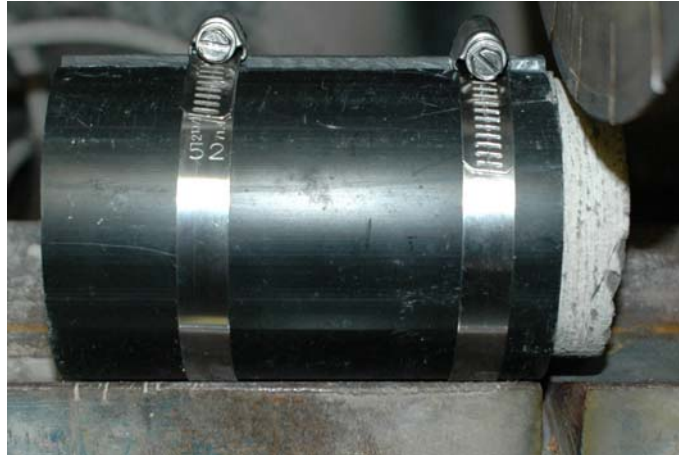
Sleeve to Maintain Specimen Integrity During Cutting Operations
